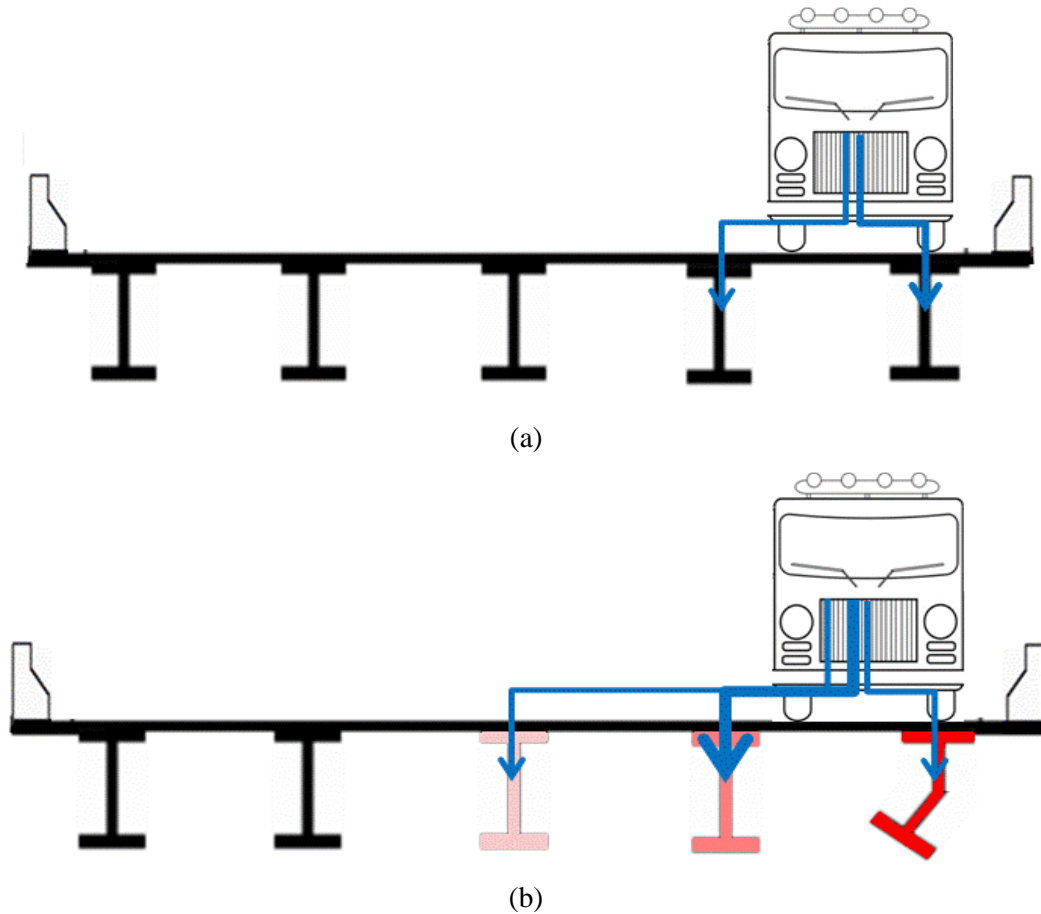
Live load distribution in a girder bridge (a) before damage, and (b) after damage
